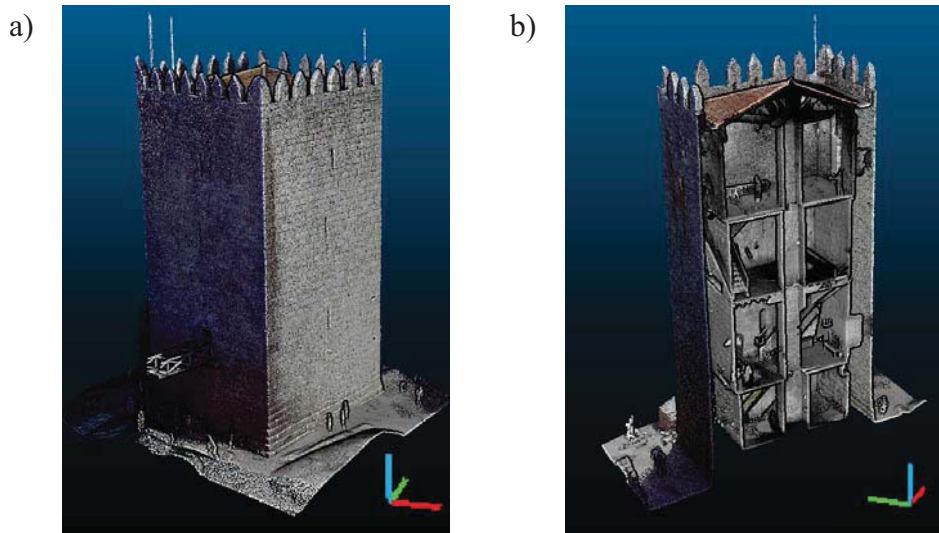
3D point cloud of the tower keep: a) exterior view; and b) section crossing the center of the tower.
